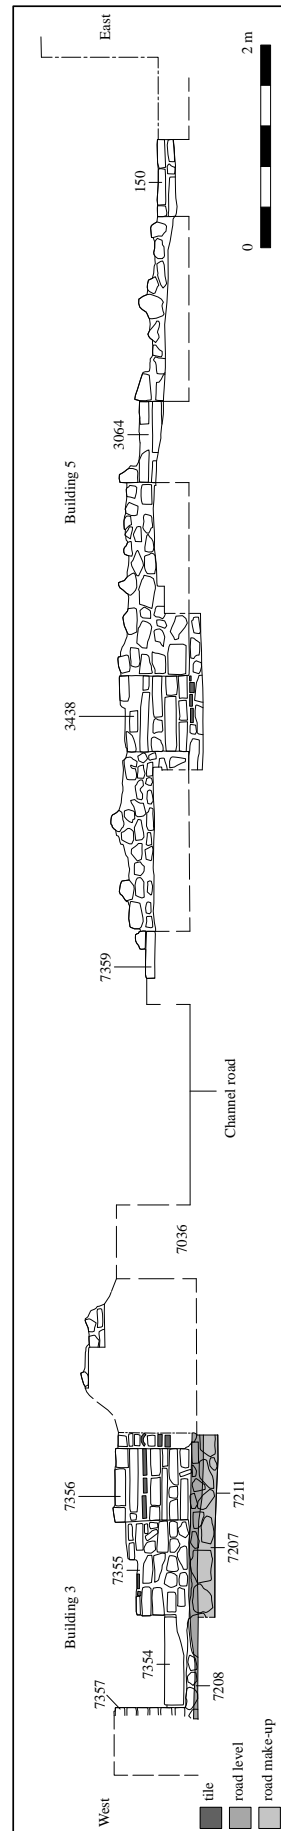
South-facing elevation of the piers of the diverticulum and the blocking walls between them
